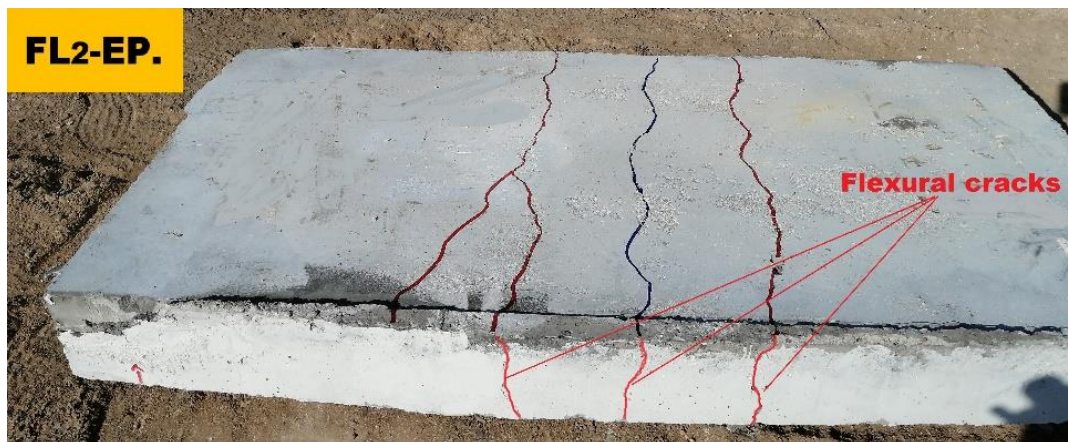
Mode of Failure and Crack Patterns for Specimen FL2-EP.
